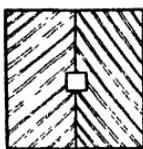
TWO HALVES OF PILLAR GROOVED AND JOINTED.
